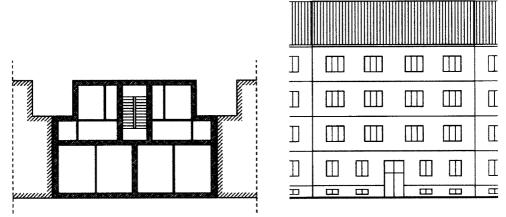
The model of a built-in apartment house from period up to 1940: characteristic floor plan and street façade. [5]
